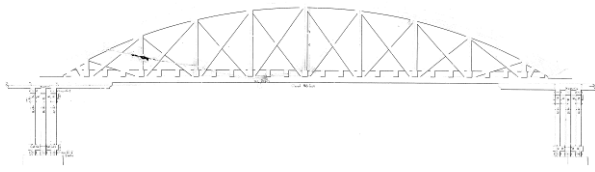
Bennett's Bendemeer Bridge, 1868 (102')
